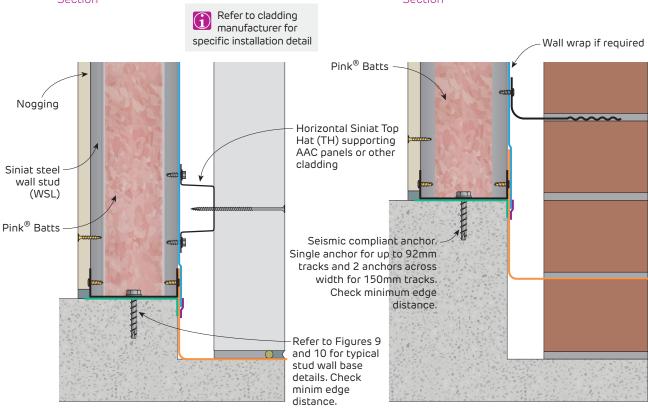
External Steel Stud Wall BaseWith horizontal Top Hats under AAC
